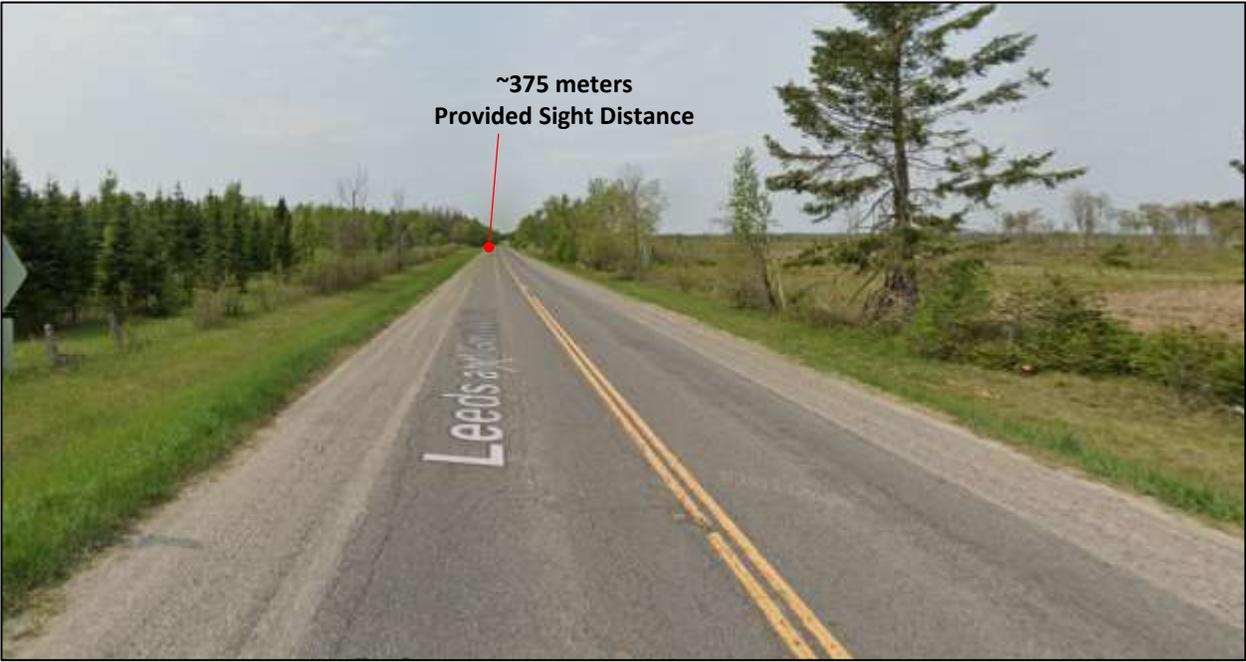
Google Street View Image of Access Sightlines Looking to the West
